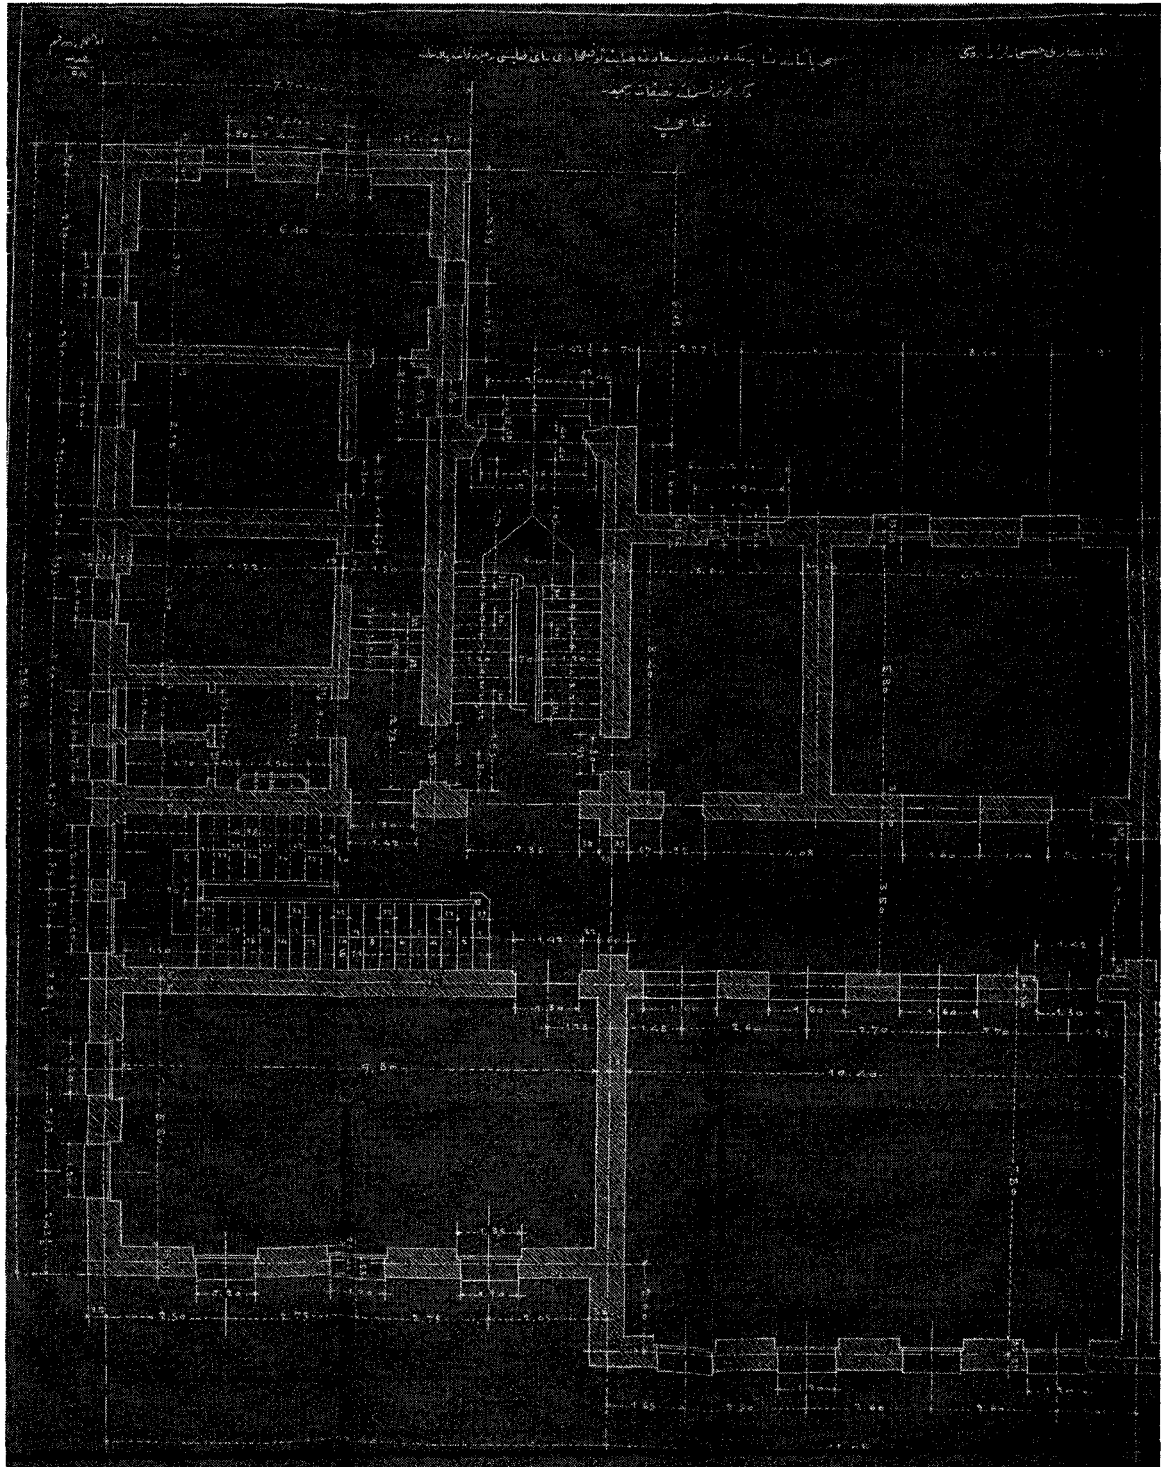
This architectural plan is for the third floor of the *Dersaadet Cinayet Tevkifhanesi* (Istanbul Jail for Serious Offenders). See BOA, DHMBHPSM 7/108.
